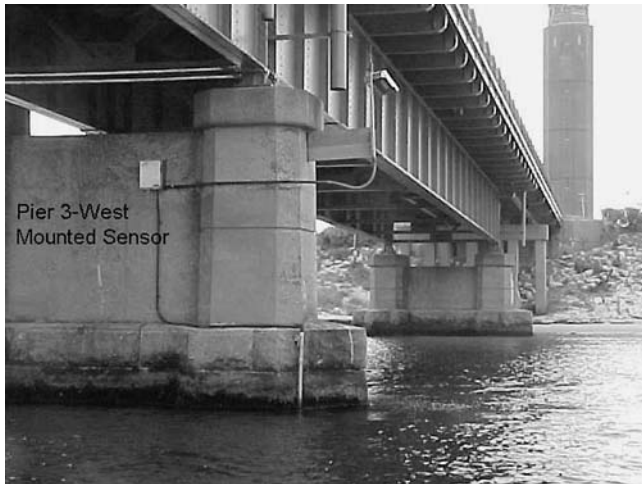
Detail of a sonar scour monitoring device mounted to a pier.
